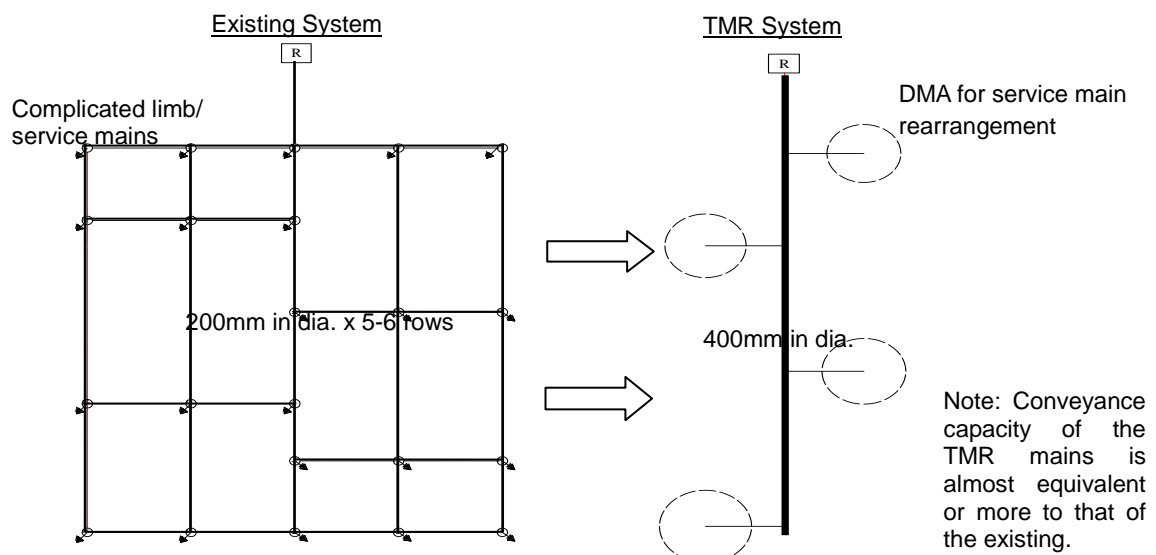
Pipe Alignment of Existing and TMR Pipe Systems
